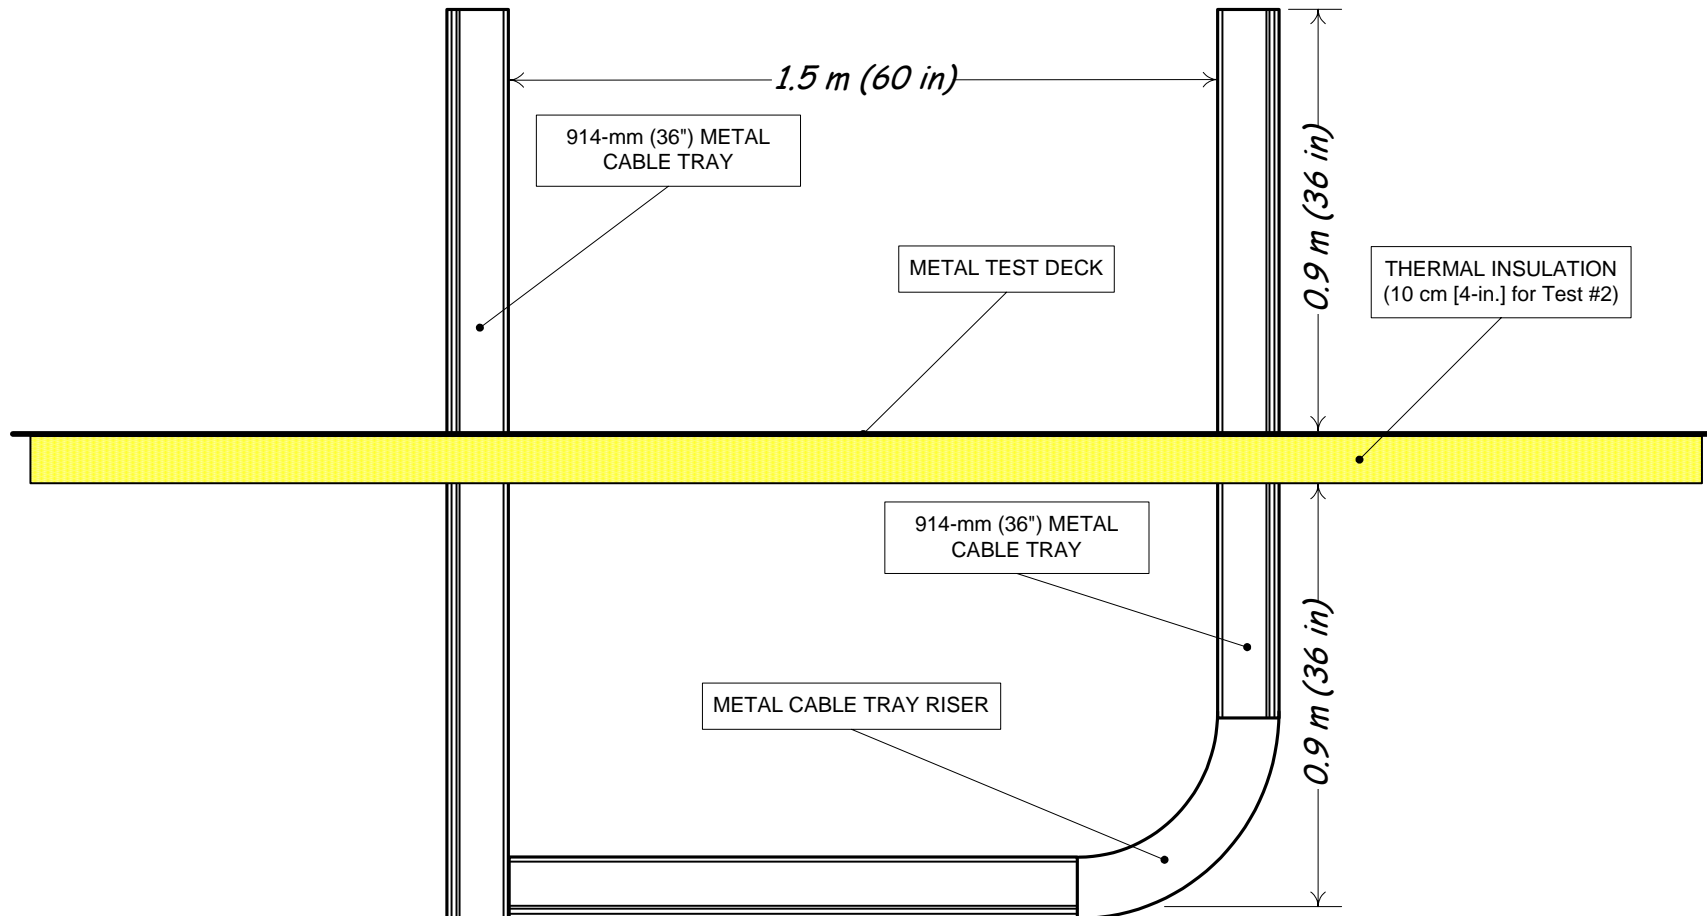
914-mm (36-in) cable tray test specimens (side view with dimensions). Cable trays will be ladder type, 18-gage galvanized steel with 10 cm (4 in) high side rails and 23 cm (9 in) rung spacing.
